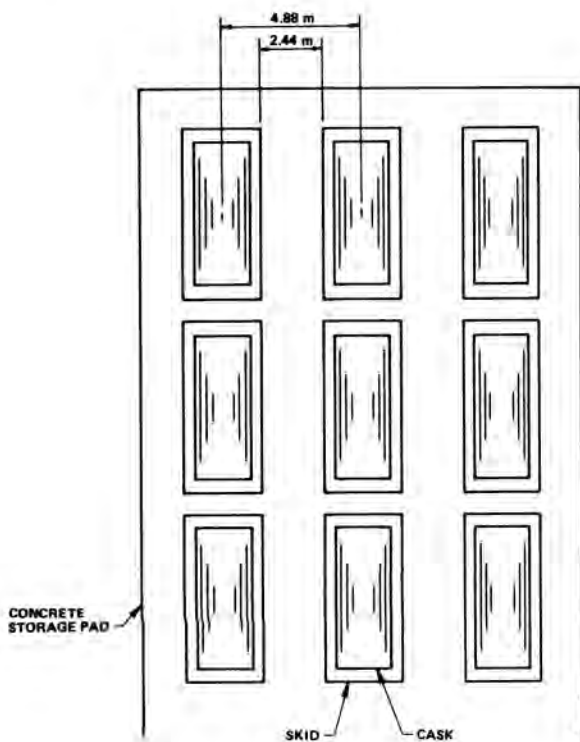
Recommended Spacing for Cask Arrays in the Horizontal Position.
